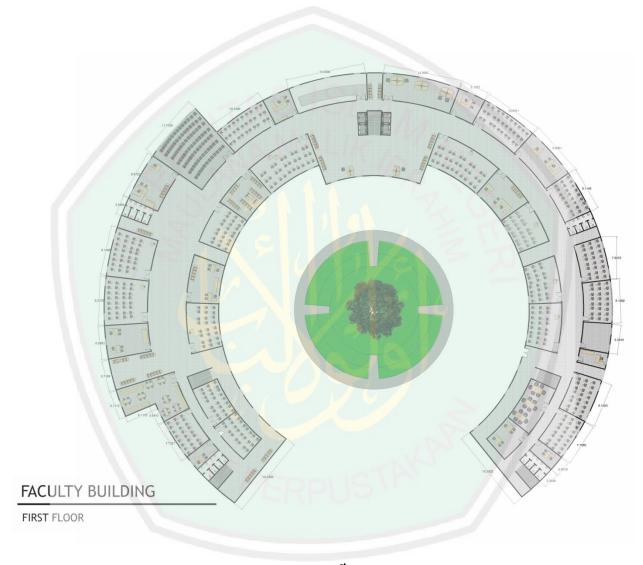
Faculty 1<sup>st</sup> floor plan
